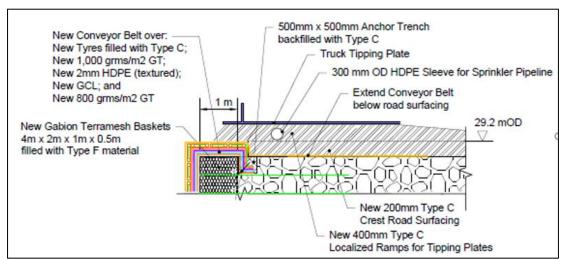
Typical Tipping Plate Section at SCDC (Source: AAL, 2021).
